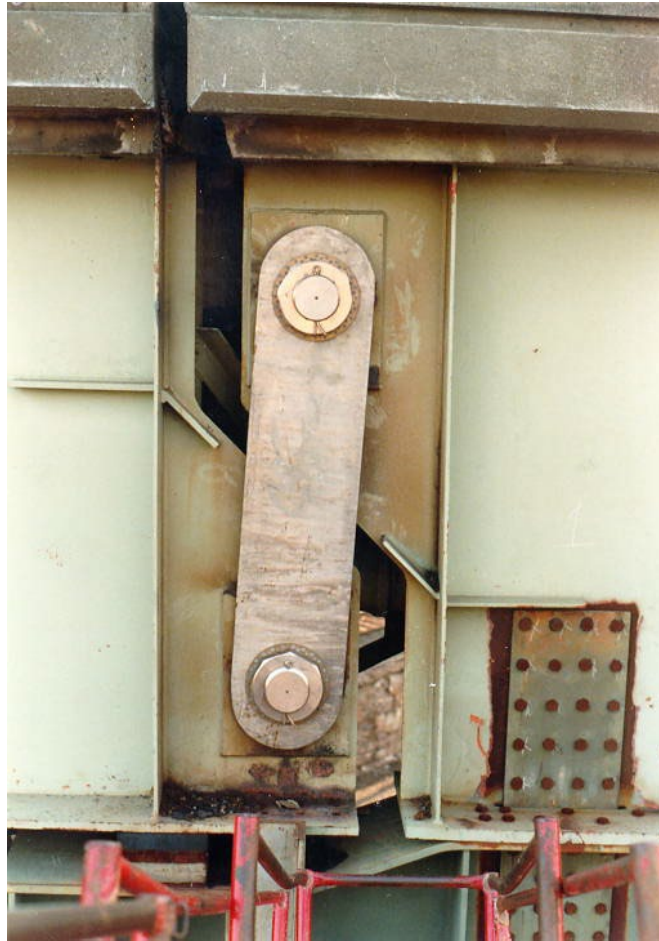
New Stainless-Steel Pin and Hanger
